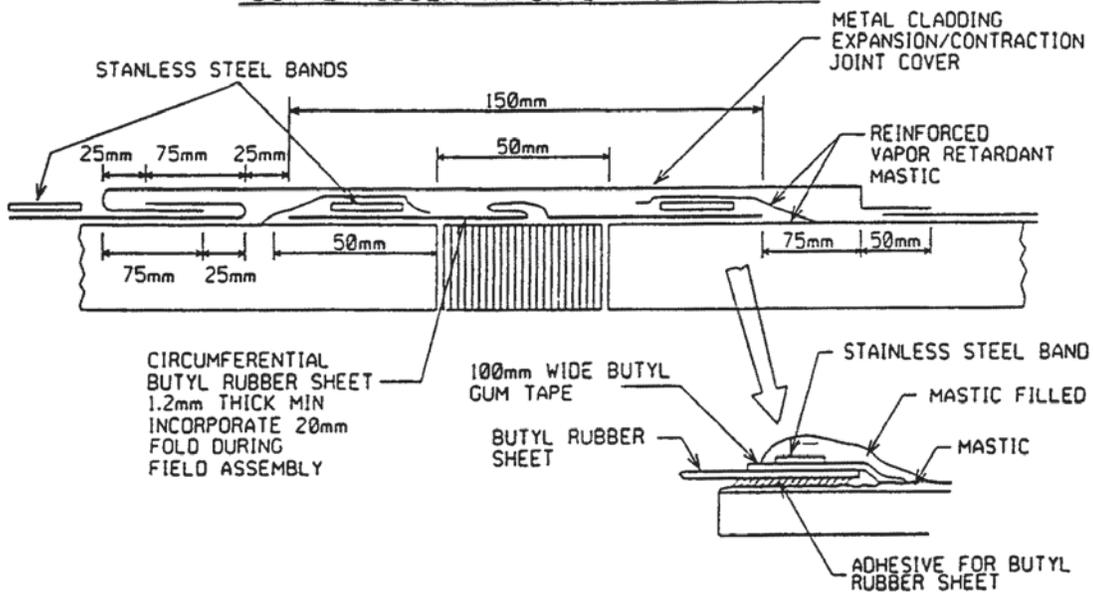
Arrangement of Expansion/Contraction Joint on Horizontal Equipment and Piping for Cold Service
